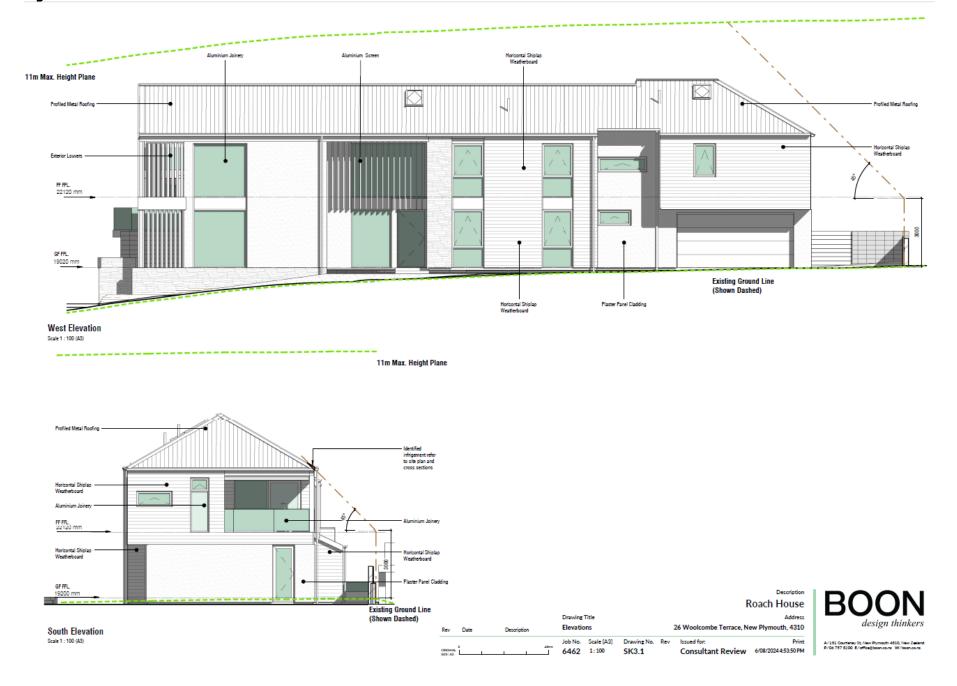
Western and Southern Elevations. Source: BOON Architects.
